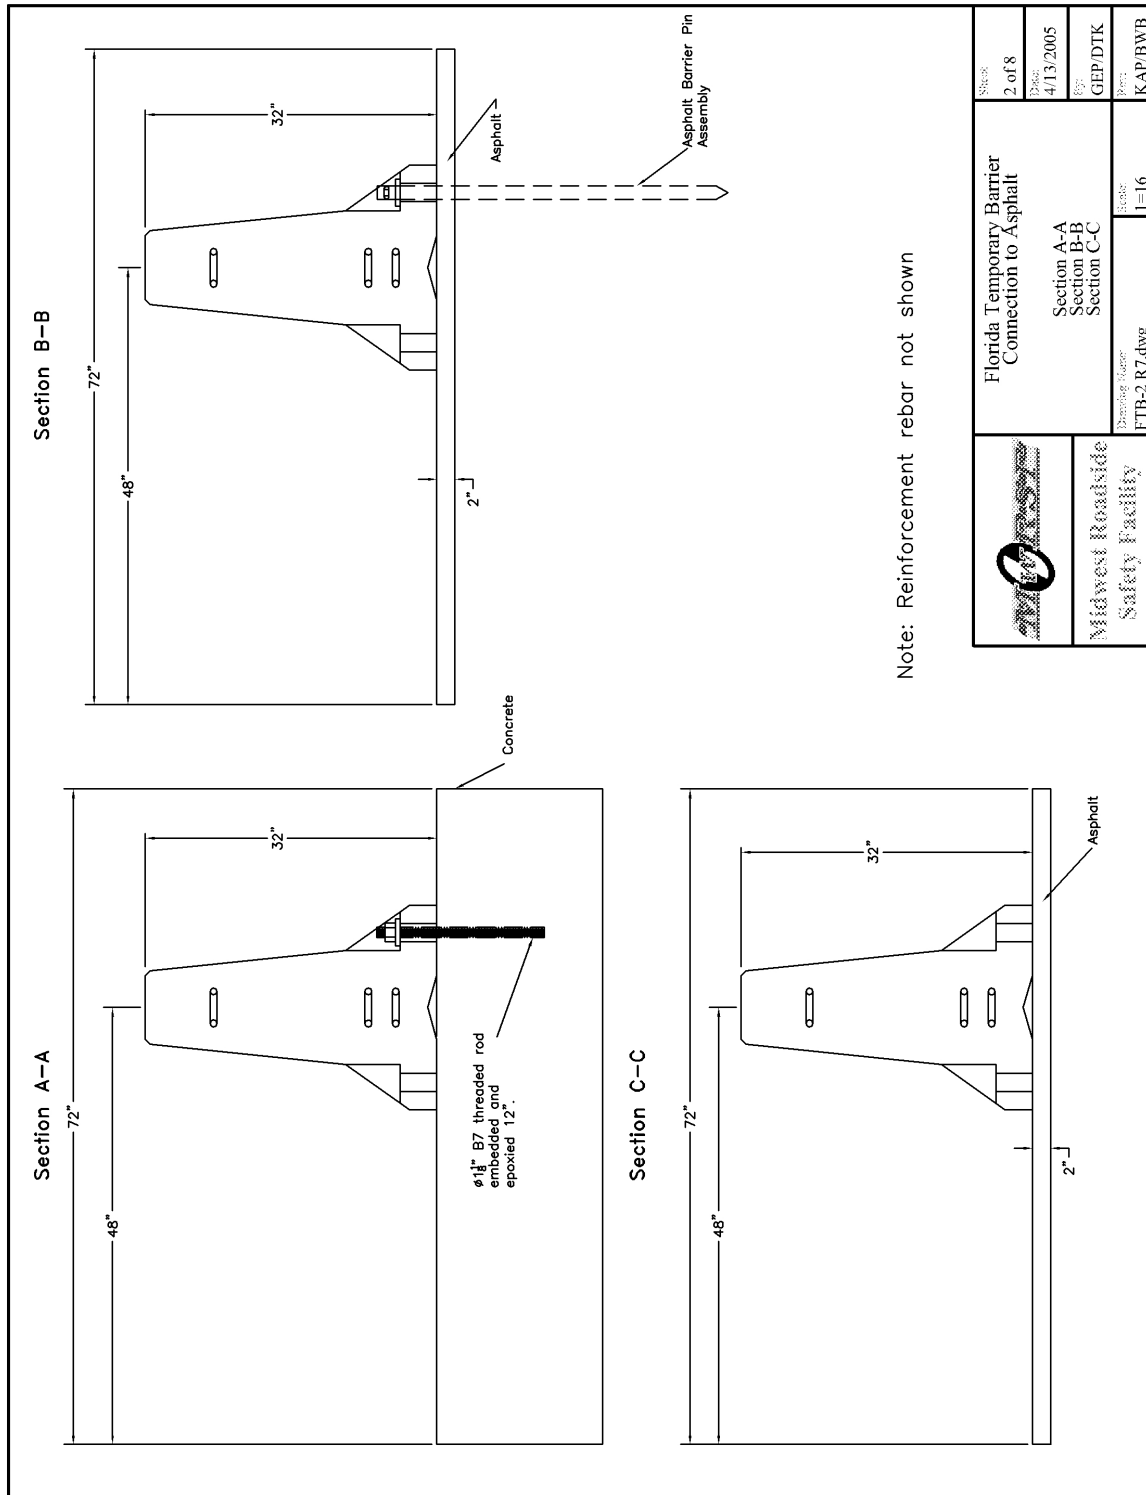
Free Standing to Rigid Barrier Transition Design Details
